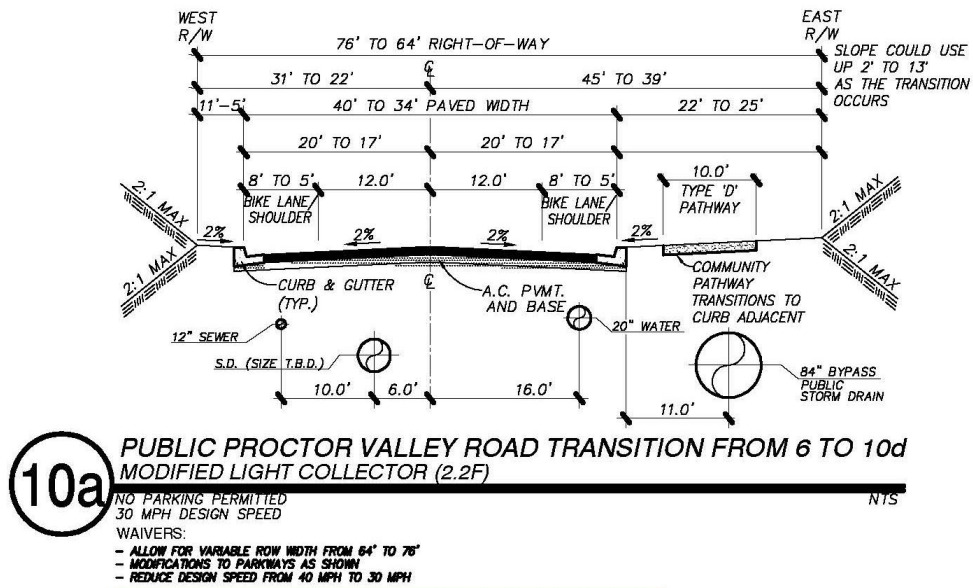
Street Section 5 - Proctor Valley Road
